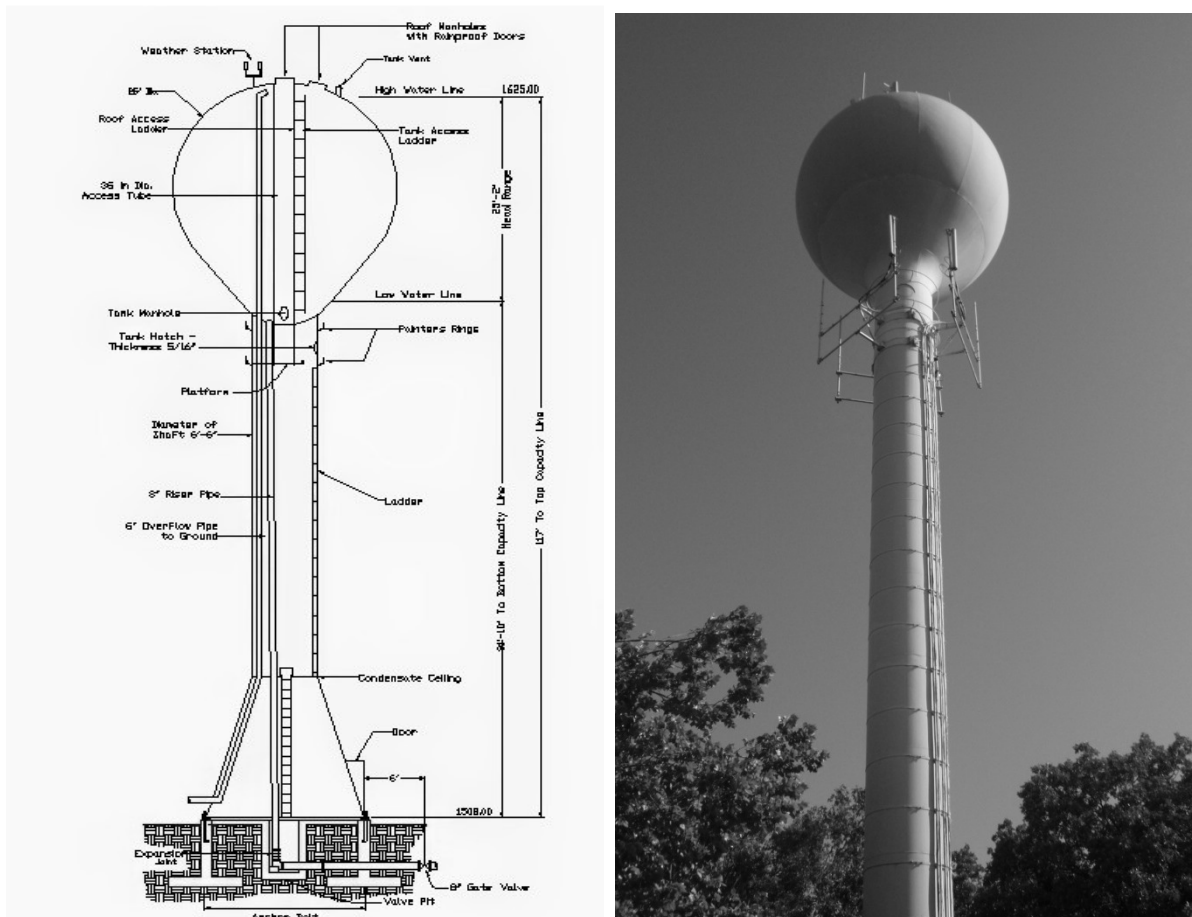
CAD Drawing (left) and picture (right) of Elevated Water Tank (Photo by Author)
